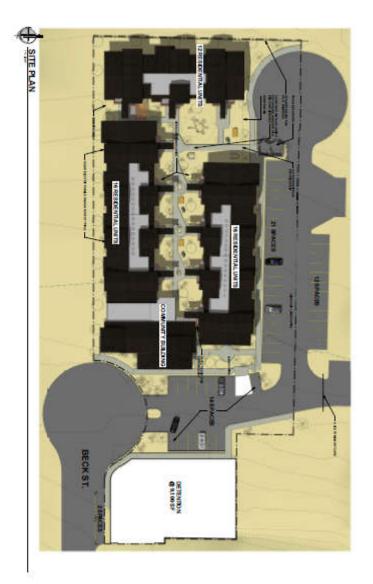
AFFORDABLE APARTMENTS SITE PLAN
